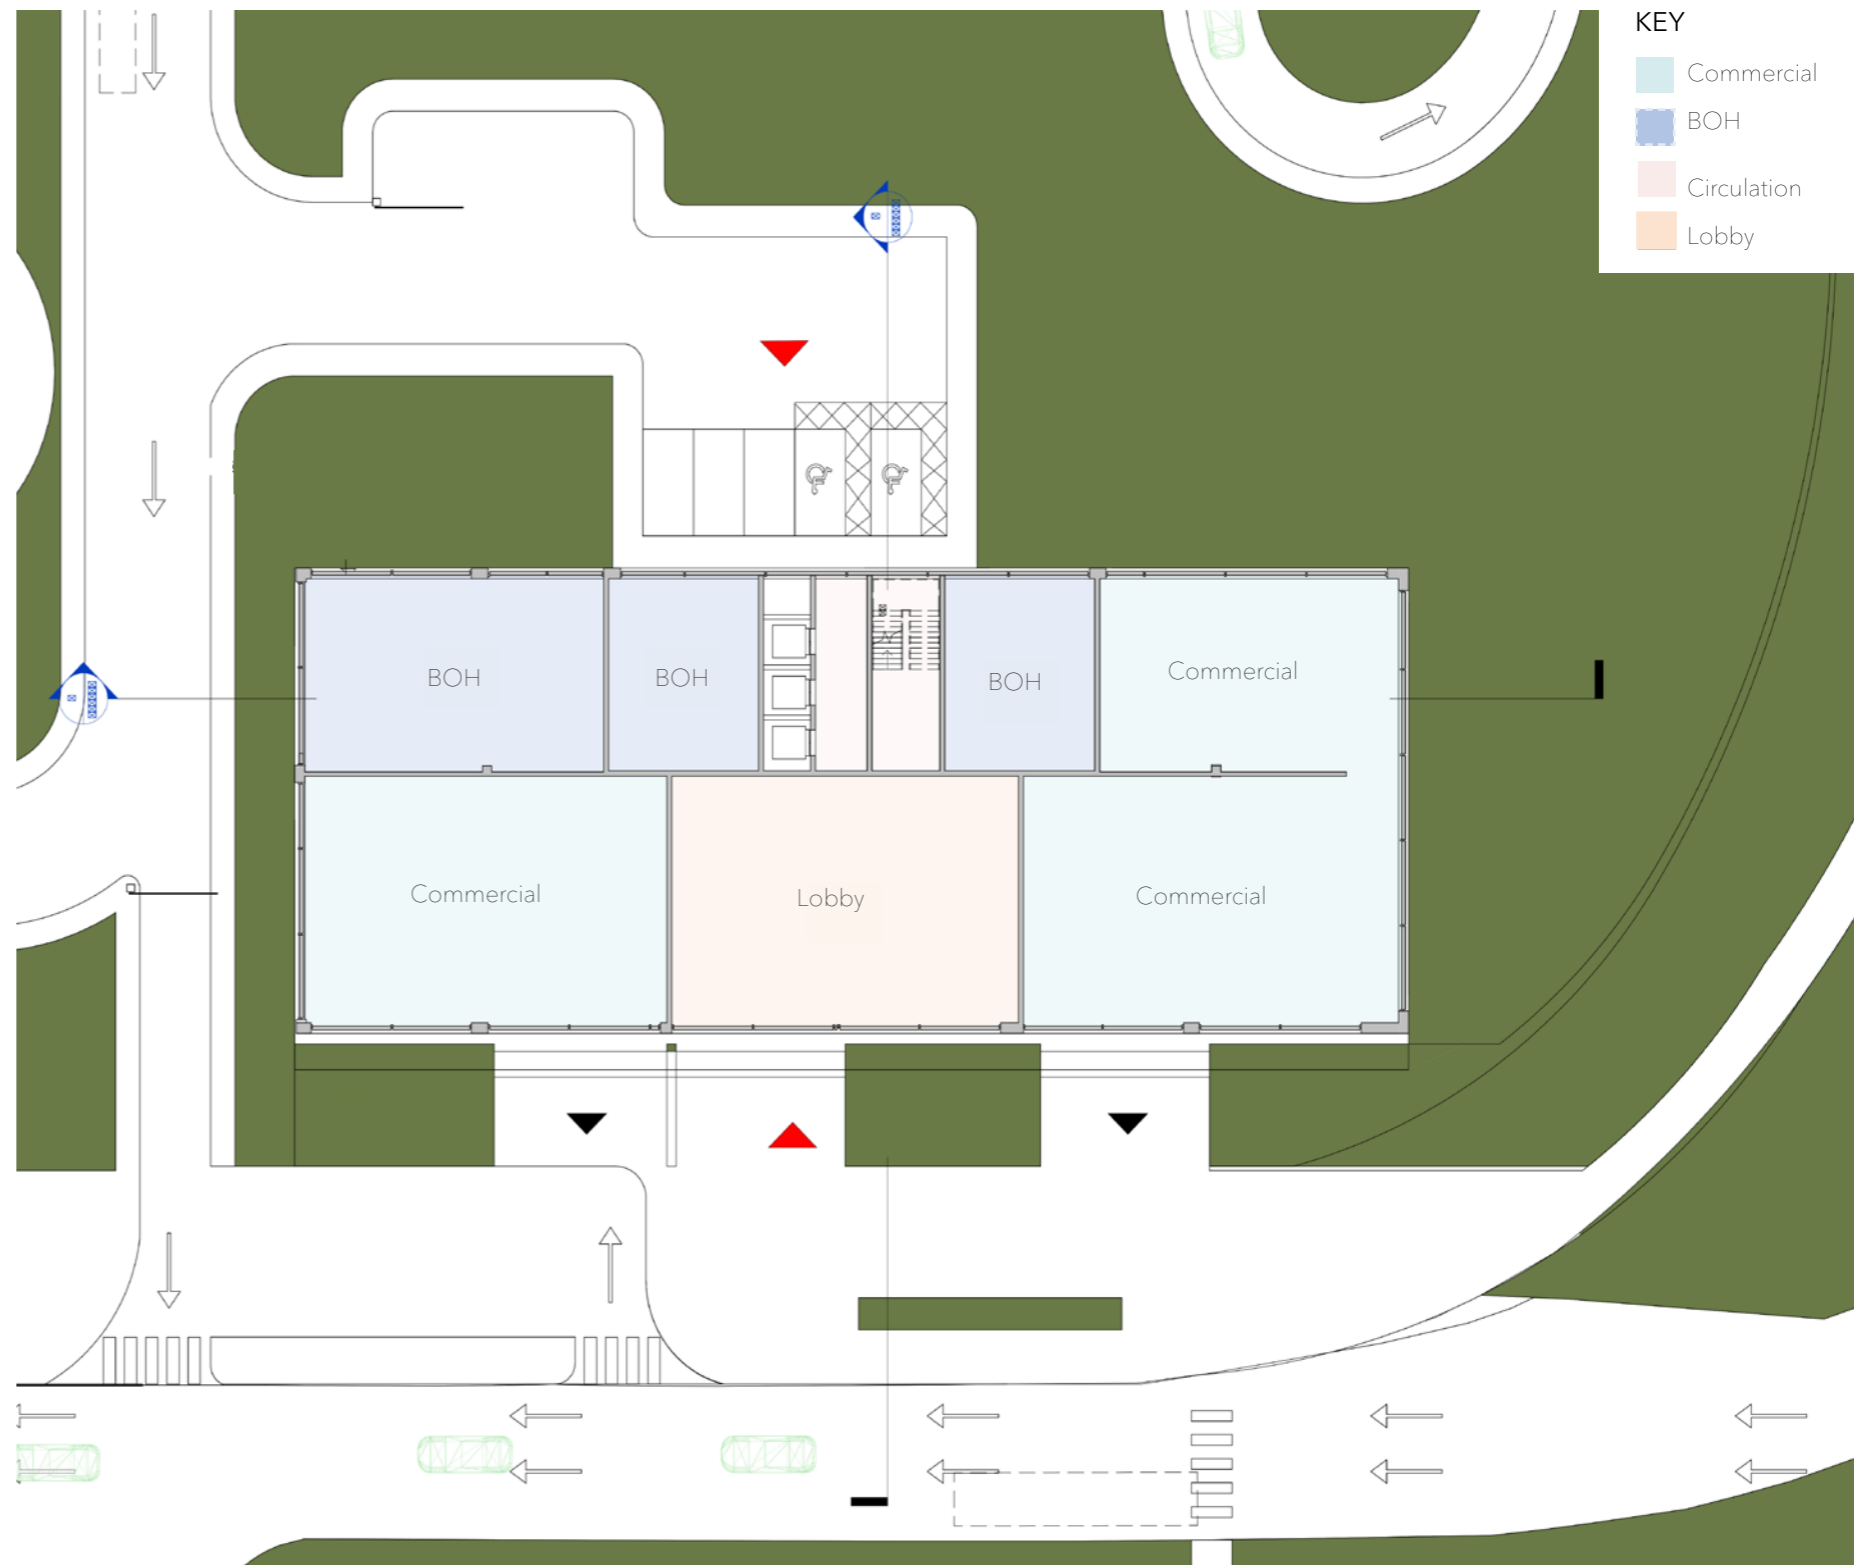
Indicative Site Plan - South Terminal Office - Car Park H
